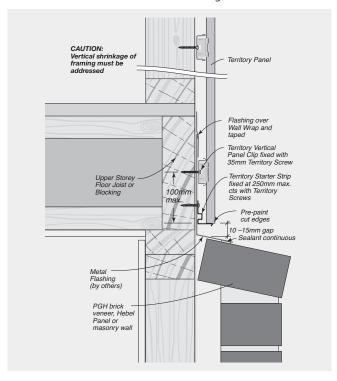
Second Storey Junction with Masonry, Brick Veneer or Hebel Panels – In-line Framing
